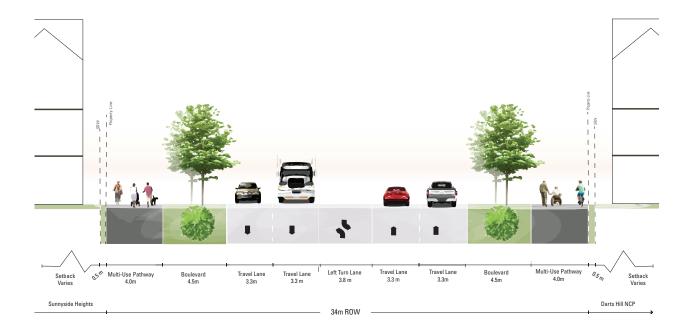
G: 168 Street Cross Section Adjacent to Darts Hill Park- 30.5 m Road Allowance
